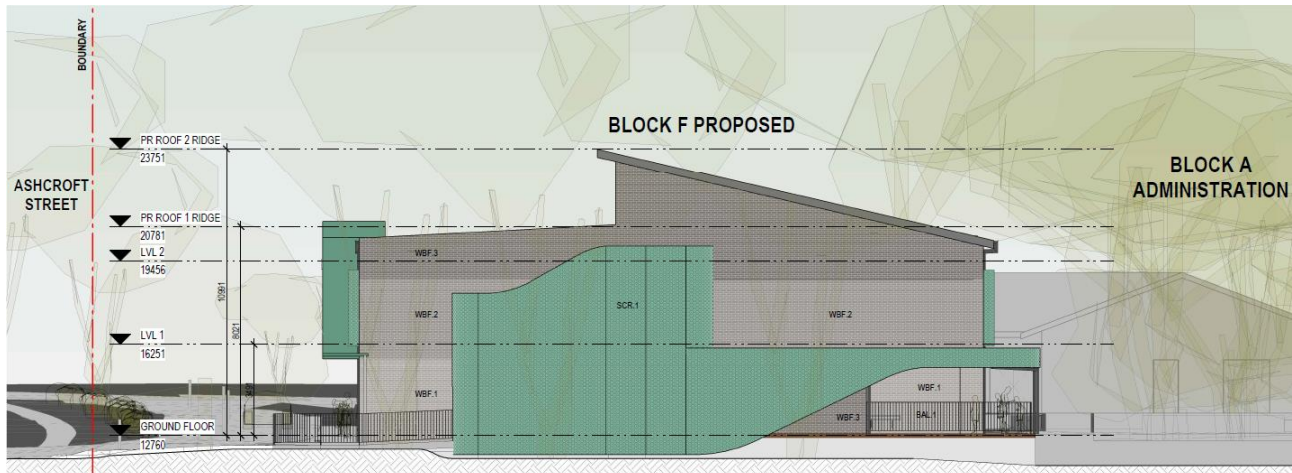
Extract of proposed northern elevation (Source: Leaf)
